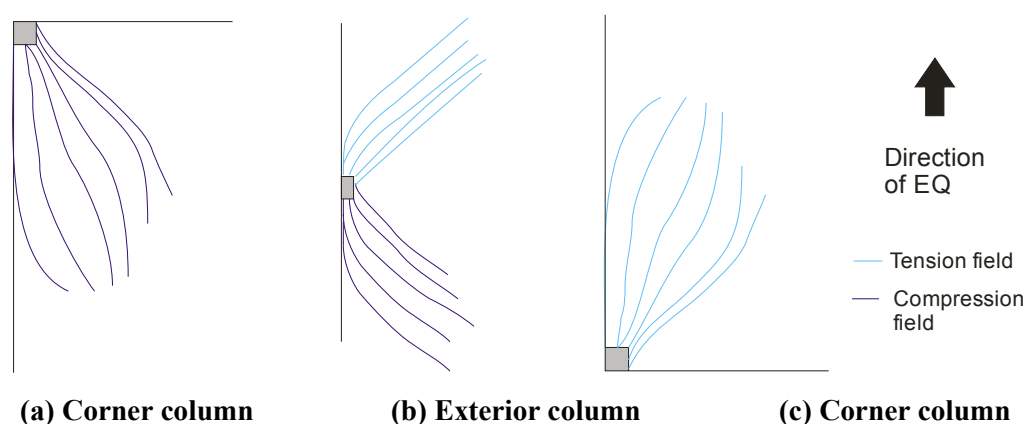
Shape of compression struts and tension ties at columns for the 1 to 1 geometric ratio floor diaphragm
